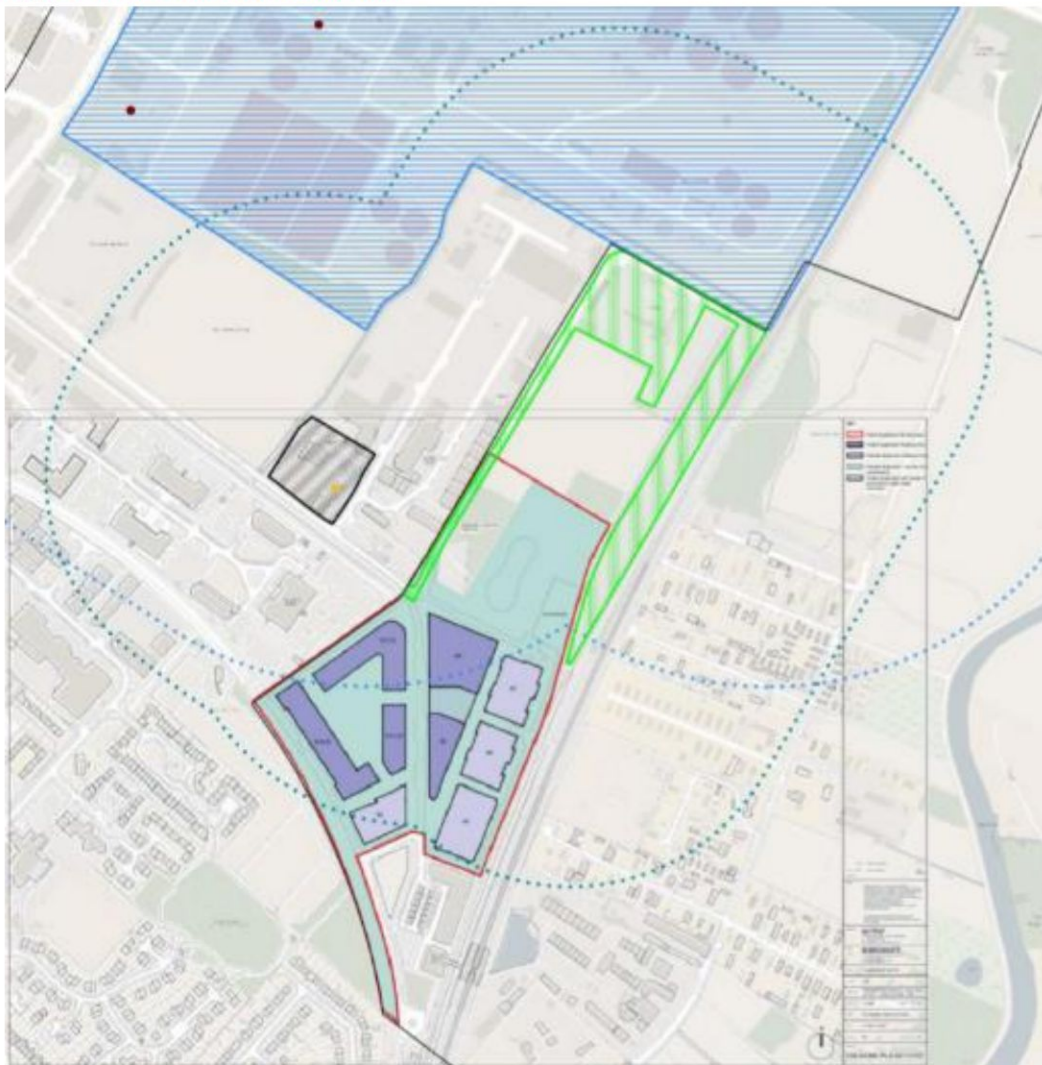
, below, shows the Proposed Development location plan. The Roadstone Coatings site (hatched light green) is located (aside from a strip located within the western boundary of the Proposed Development Site, forming an access road) directly to the north and northeast of the Proposed Development, denoted by the redline Site boundary. The railway siding (also hatched green), which is used to temporarily store aggregates before being taken to the main Railhead site, abuts the north-eastern boundary of the North Cambridge Development Area. The Cowley Road Waste Management Area is hatched grey. The hatched blue area represents a sewage treatment works, which is not expected to result in effects on the Site.
